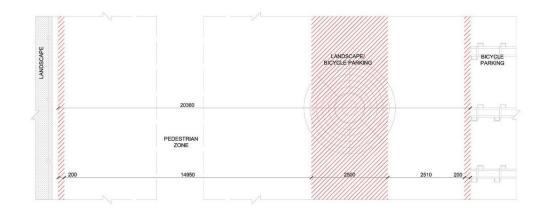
Street width and buffer spaces (in mm) for Gateway 4 in the area surrounding Darmstadt Hauptbahnhof
